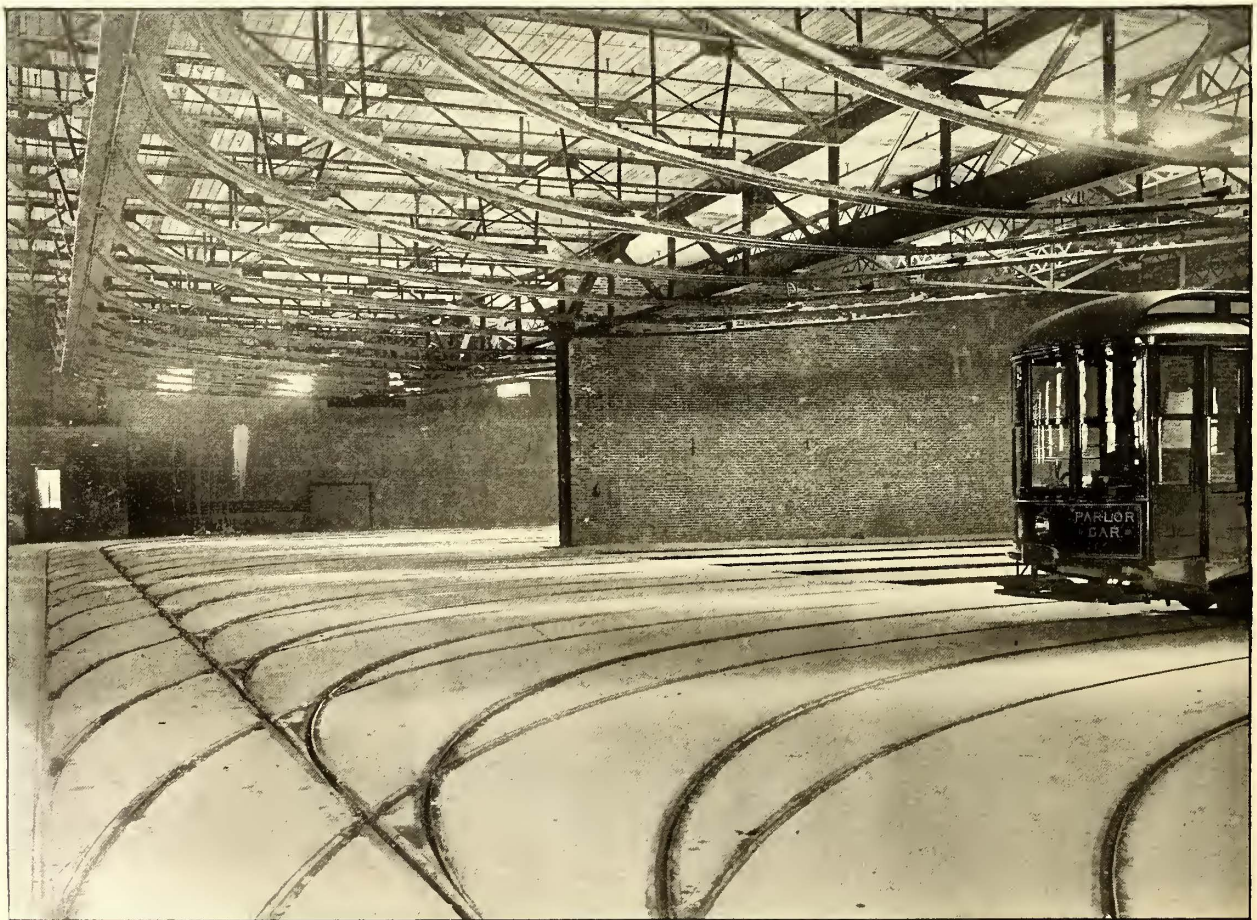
INTERIOR OF CAR HOUSE, SHOWING OVERHEAD CONSTRUCTION—SPRINGFIELD
